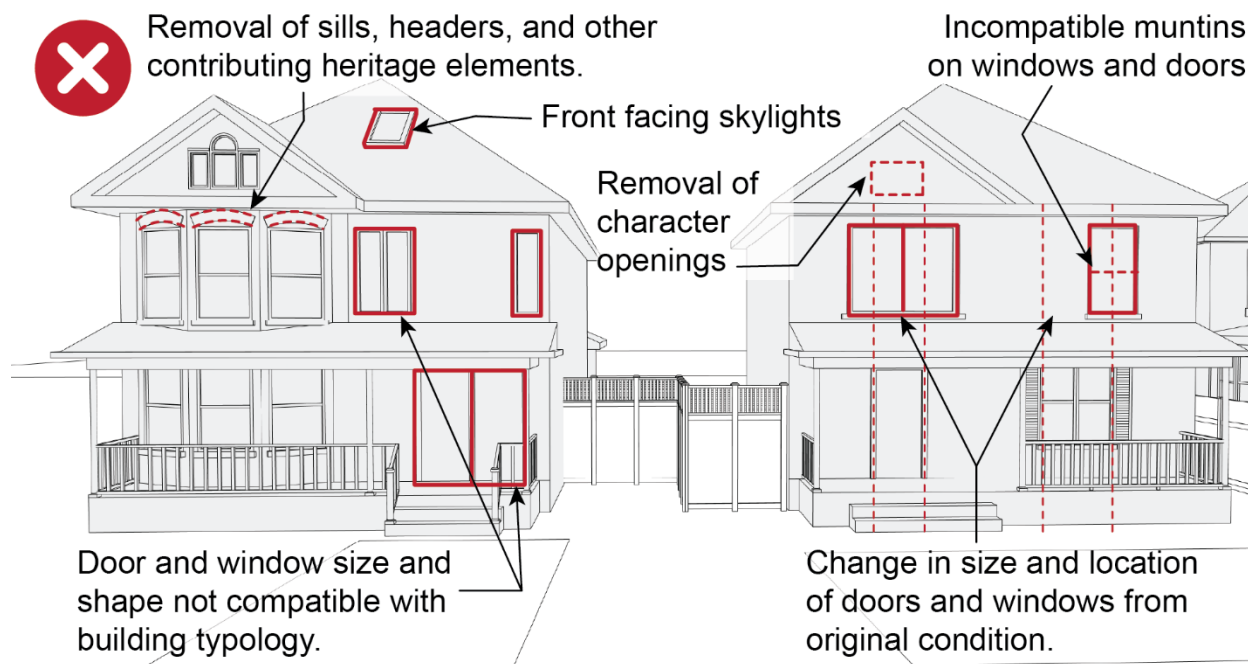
Graphic showing incompatible alterations to window and door openings of contributing residential properties. This includes the removal of architectural elements as well as altering the size and location of original openings.
